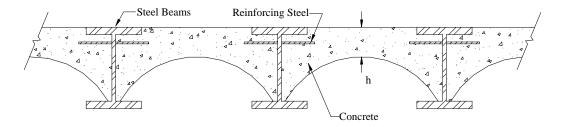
Modified beam-in-slab system (1 in.= 25.4 mm)
